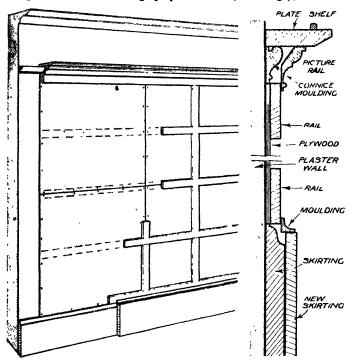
How Plywood Panels are Fixed to Wall. Shows also how the framing rails are applied over them.
